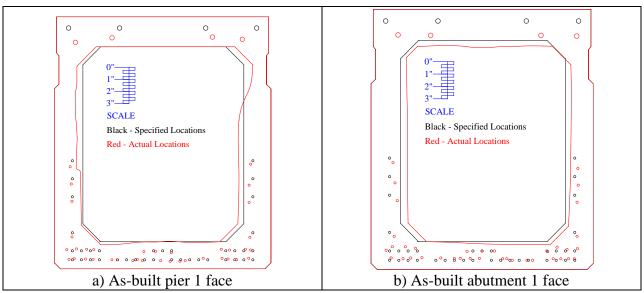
As-Built Section Geometry of Span 1 Beam 3 of Clearfield Creek Bridge
